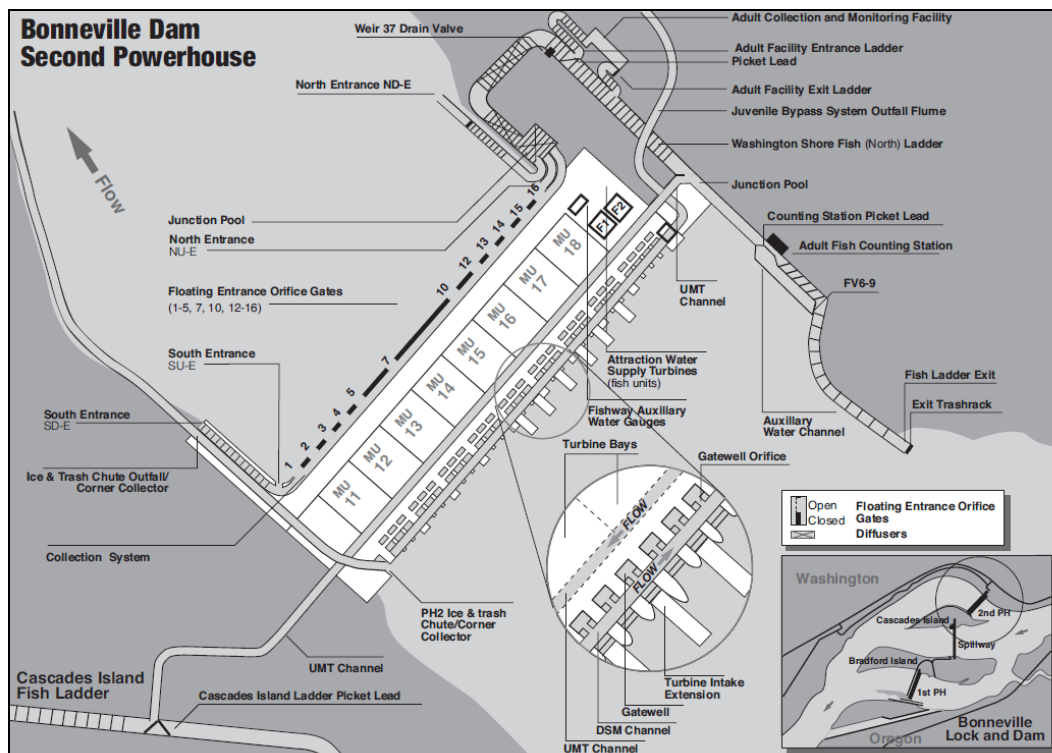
Bonneville Dam Second Powerhouse and Washington (North) Fish Ladder (source: USACE)
